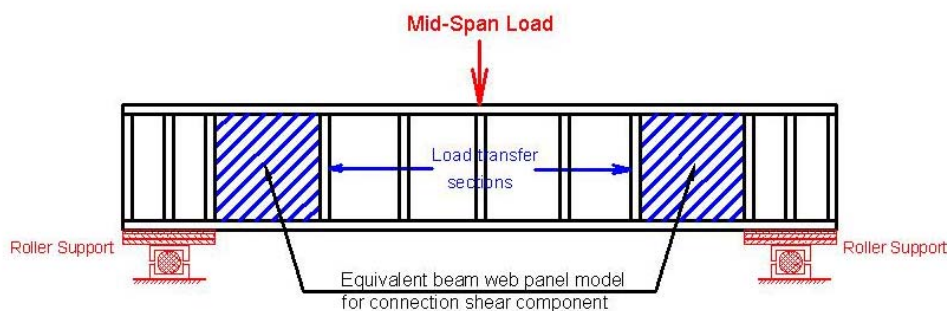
Equivalent Shear Zone Model for Steel Beam-to-Column Joint
